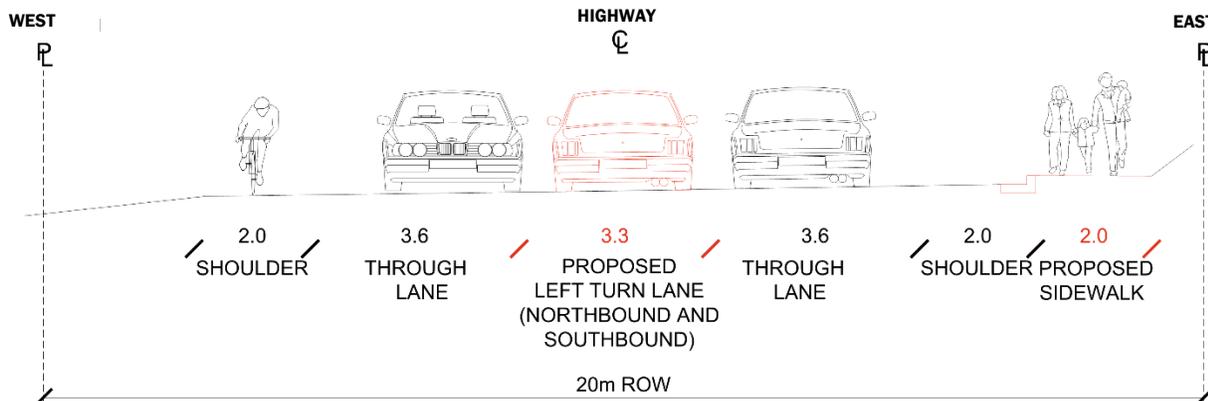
Proposed Cross Section Through Davis Bay Segment of Highway 101
